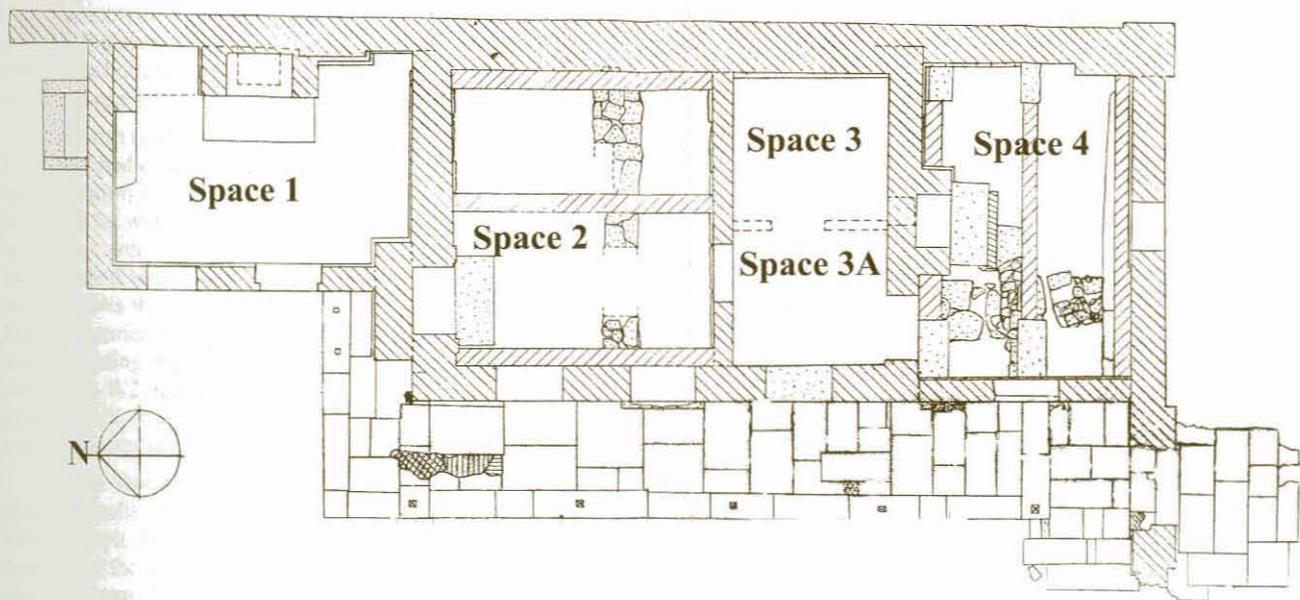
PACDP excavation plan of the sub-floor level of the cottage showing evidence of major demolished features including the former stables internal wall base in S2 and O'Brien's privy base in S4, the placement of the structure against a pre-existing wall to the east, the post-O'Brien erection of a skillion-roofed addition to the north (S1), and the complexity of the additions to the south as represented by S4. (Graham Wilson and David Starley, PACDP 1983)
